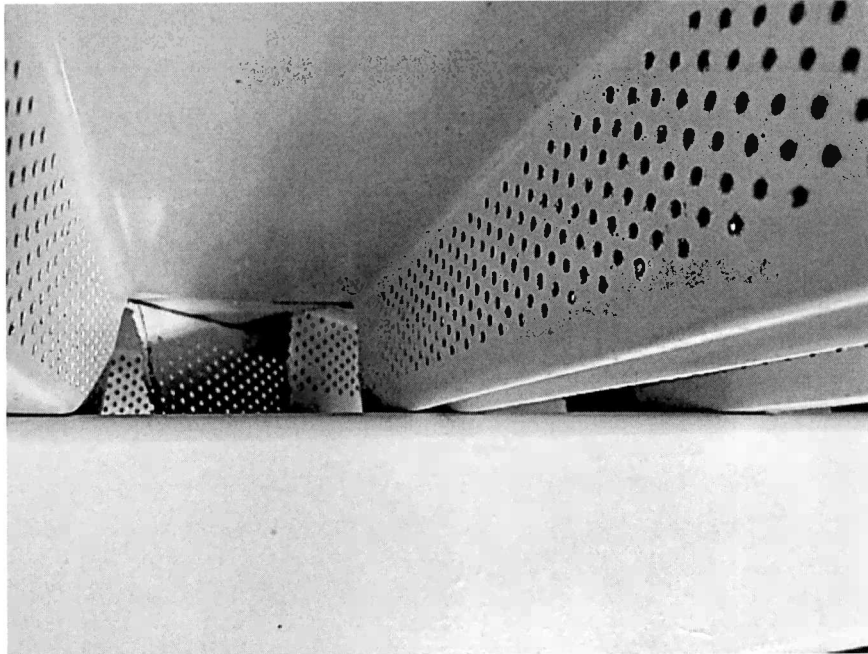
Lightly damaged roof deck bearing at north-west truss
